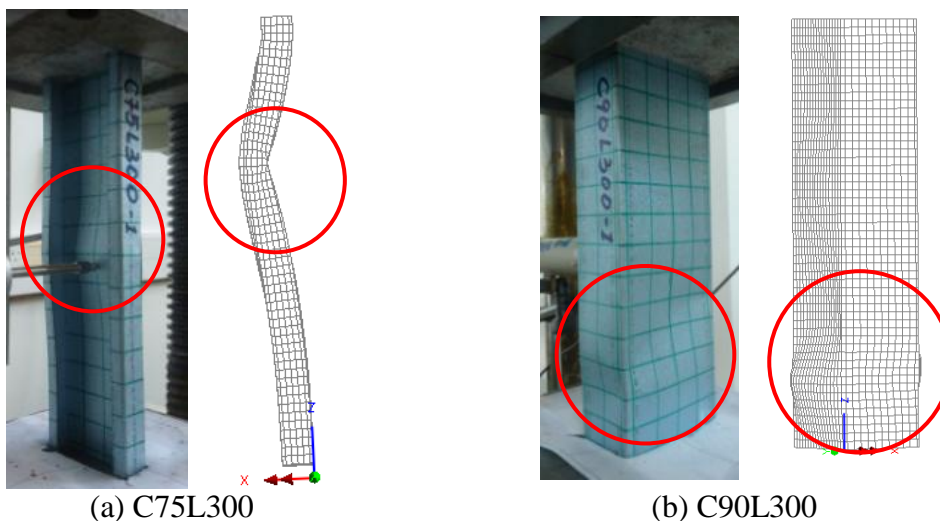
Failure Modes of FE and Tested C75L300 and C90L300 C-channel (C) Stub Columns
